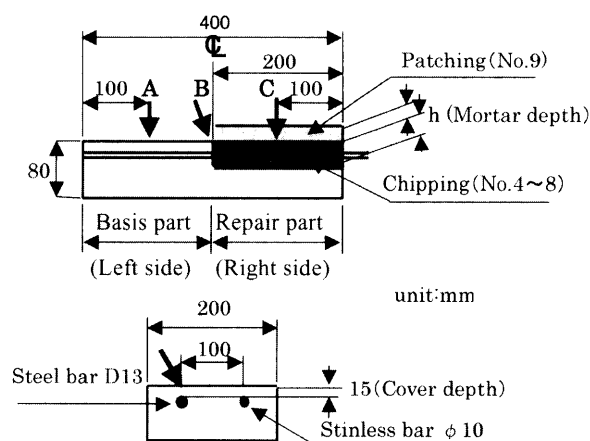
Dimensions of reinforced concrete specimen for steel corrosion test.
